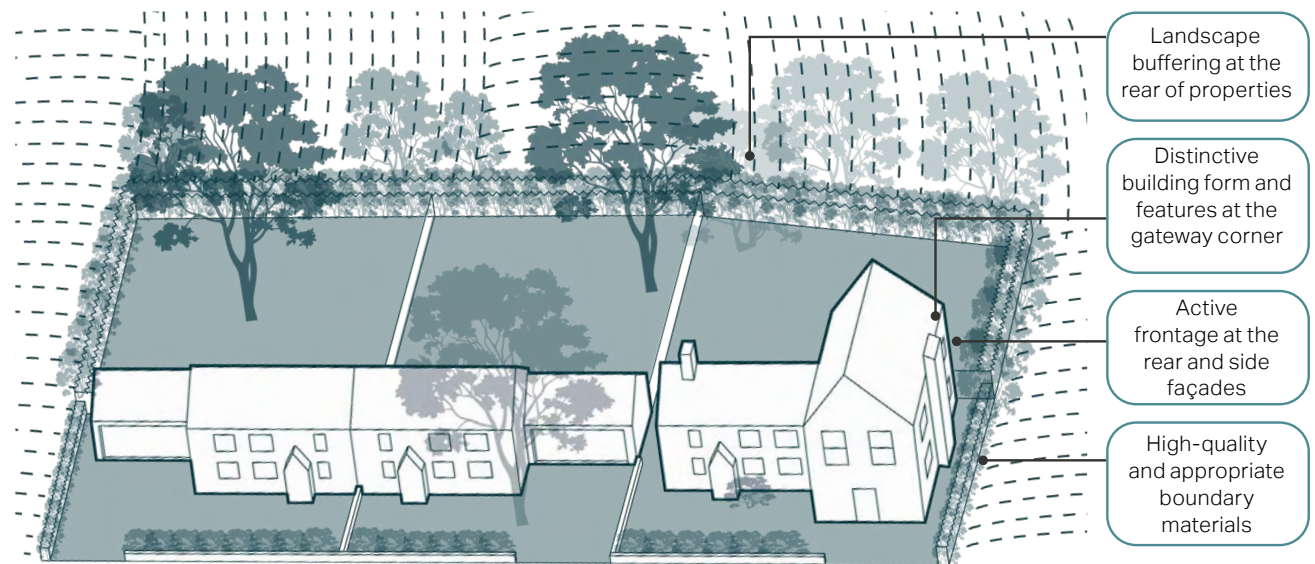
Diagram illustrating best design practice for buildings located at the settlement edge and at key gateway points.
